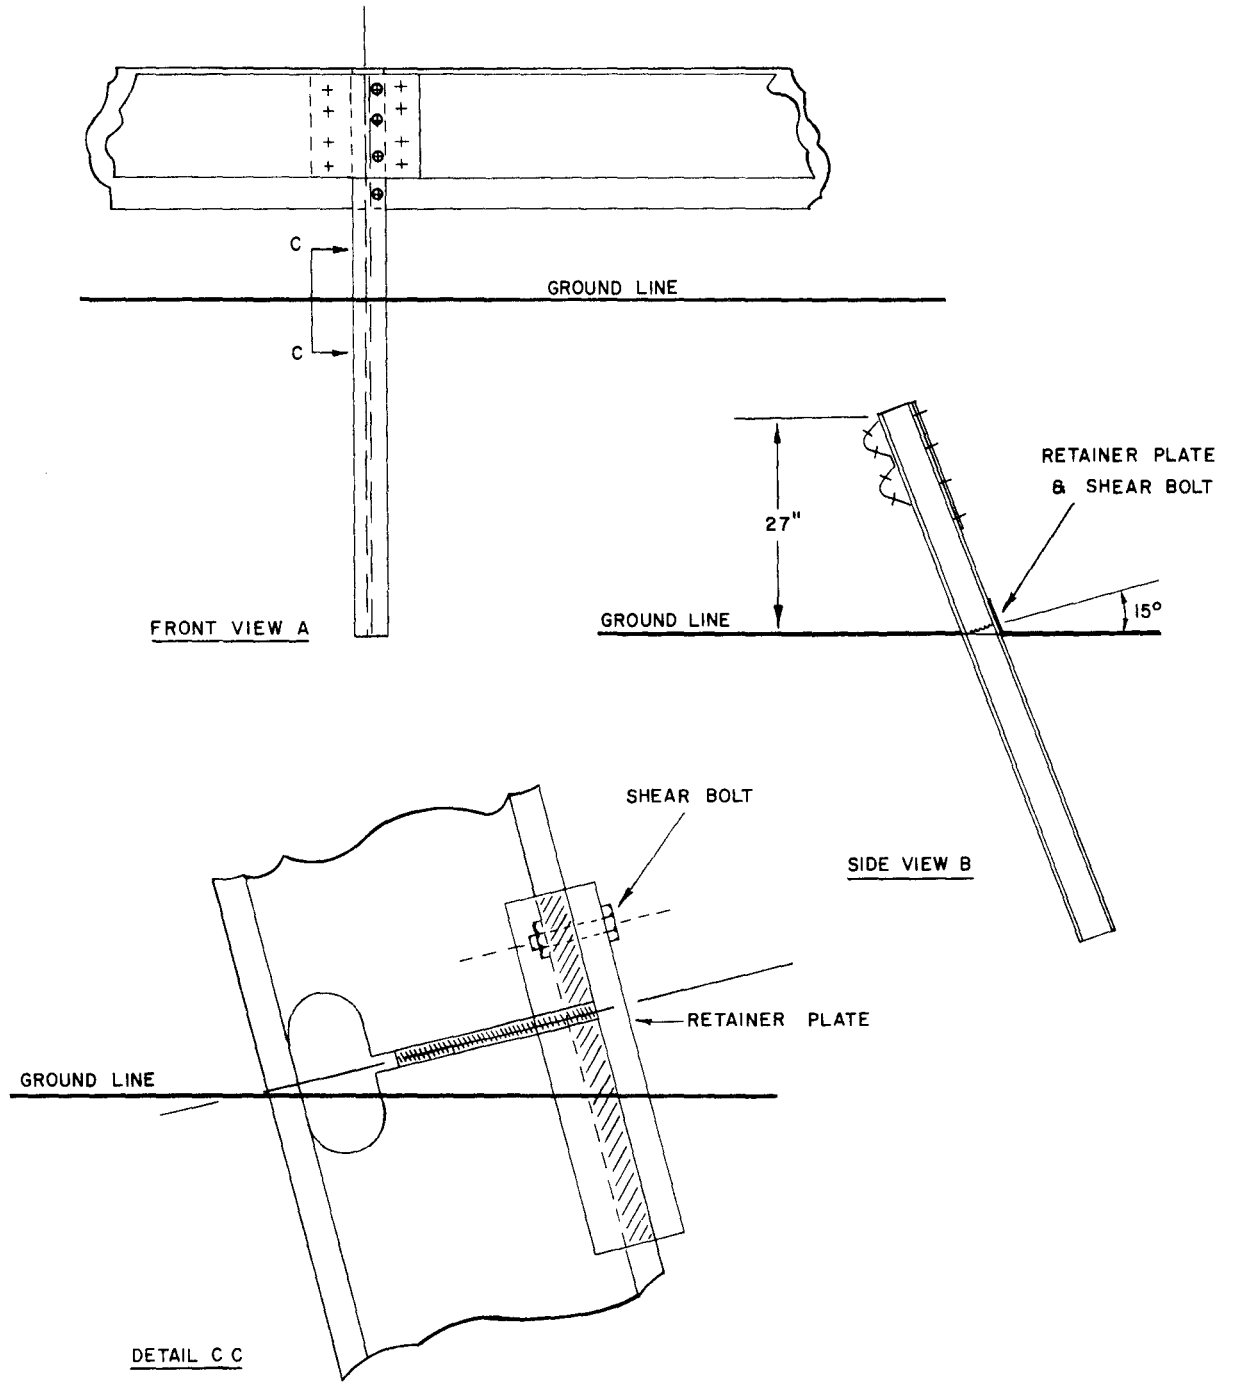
, DETAIL OF ONE-WAY GUARDRAIL SYSTEM
